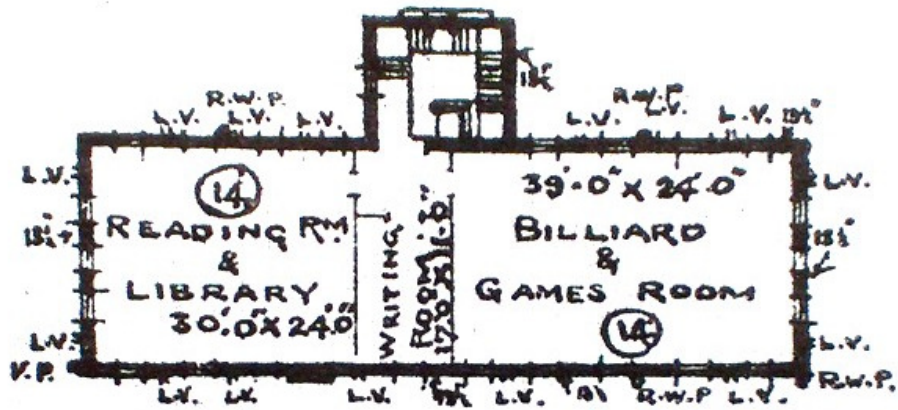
Extract from 1911 plan showing the original function and layout of the first floor of HYD 11 (EHA 95/1580).
